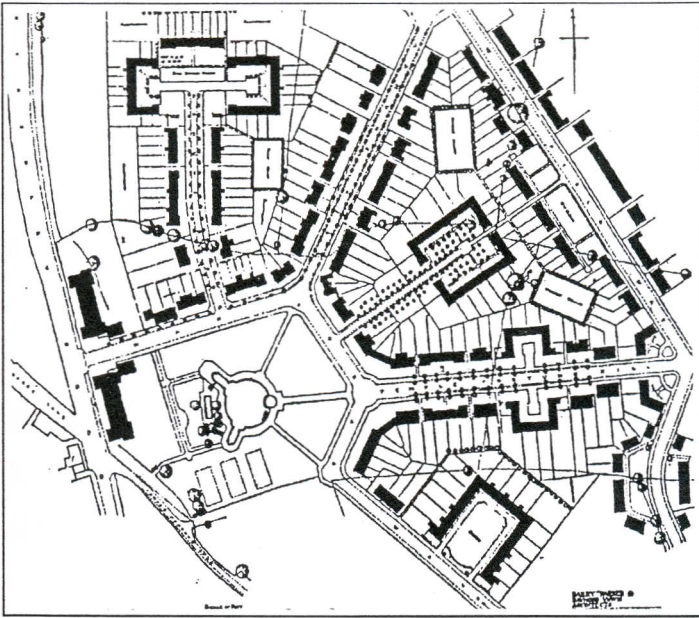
Hampstead Garden Suburb plan (Source: Southworth and Ben Joseph 1996).
